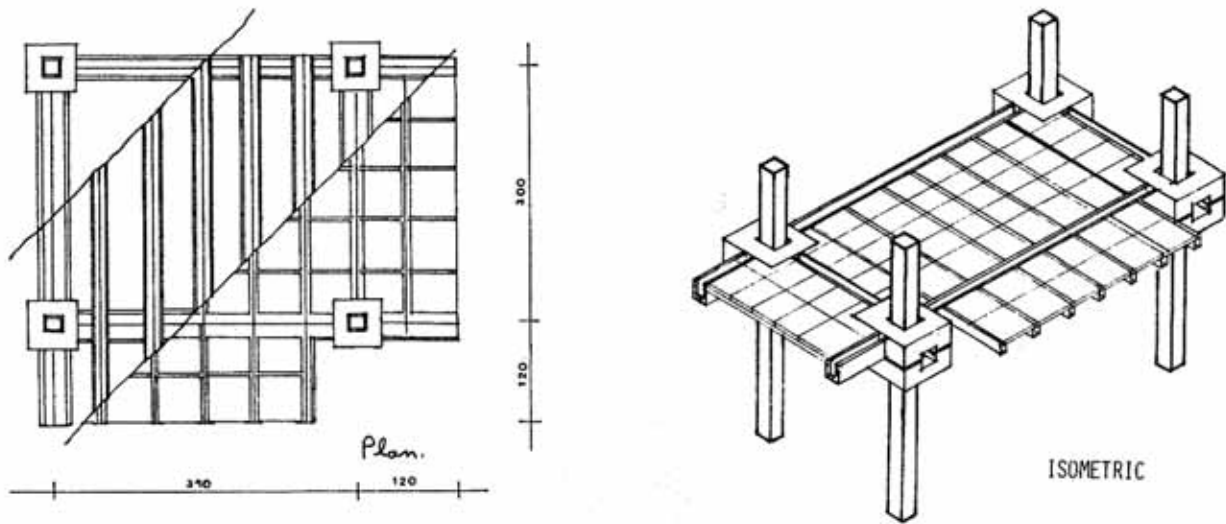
Filler slab (tilecrete) roof (Ref. 27).
